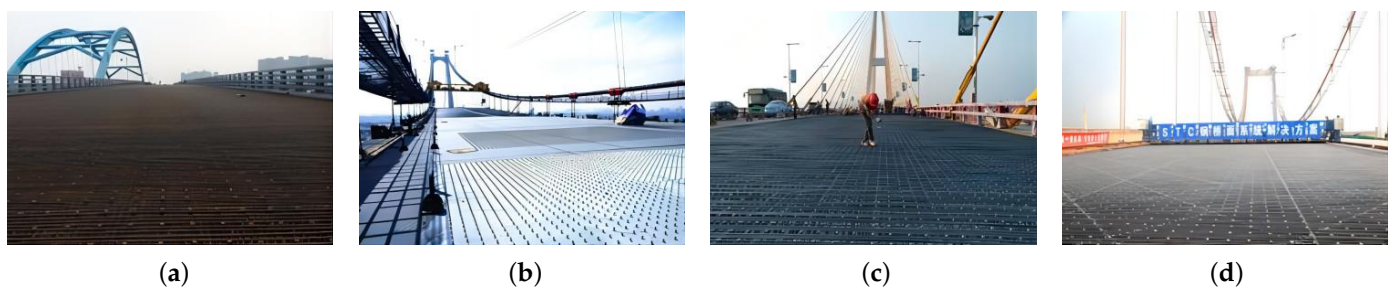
Bridge deck under construction: (a) Fochan New Bridge; (b) Hangrui Dongting Lake Bridge; (c) Qeshi Bridge; (d) Fengxi Bridge.
